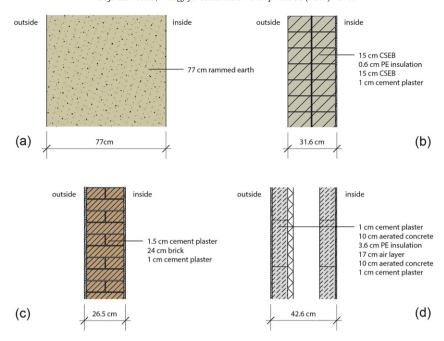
Structure of the four investigated walls in Thimphu: (a) rammed earth wall, (b) cement stabilised earth block wall, (c) brick wall and (d) aerated concrete block wall.
